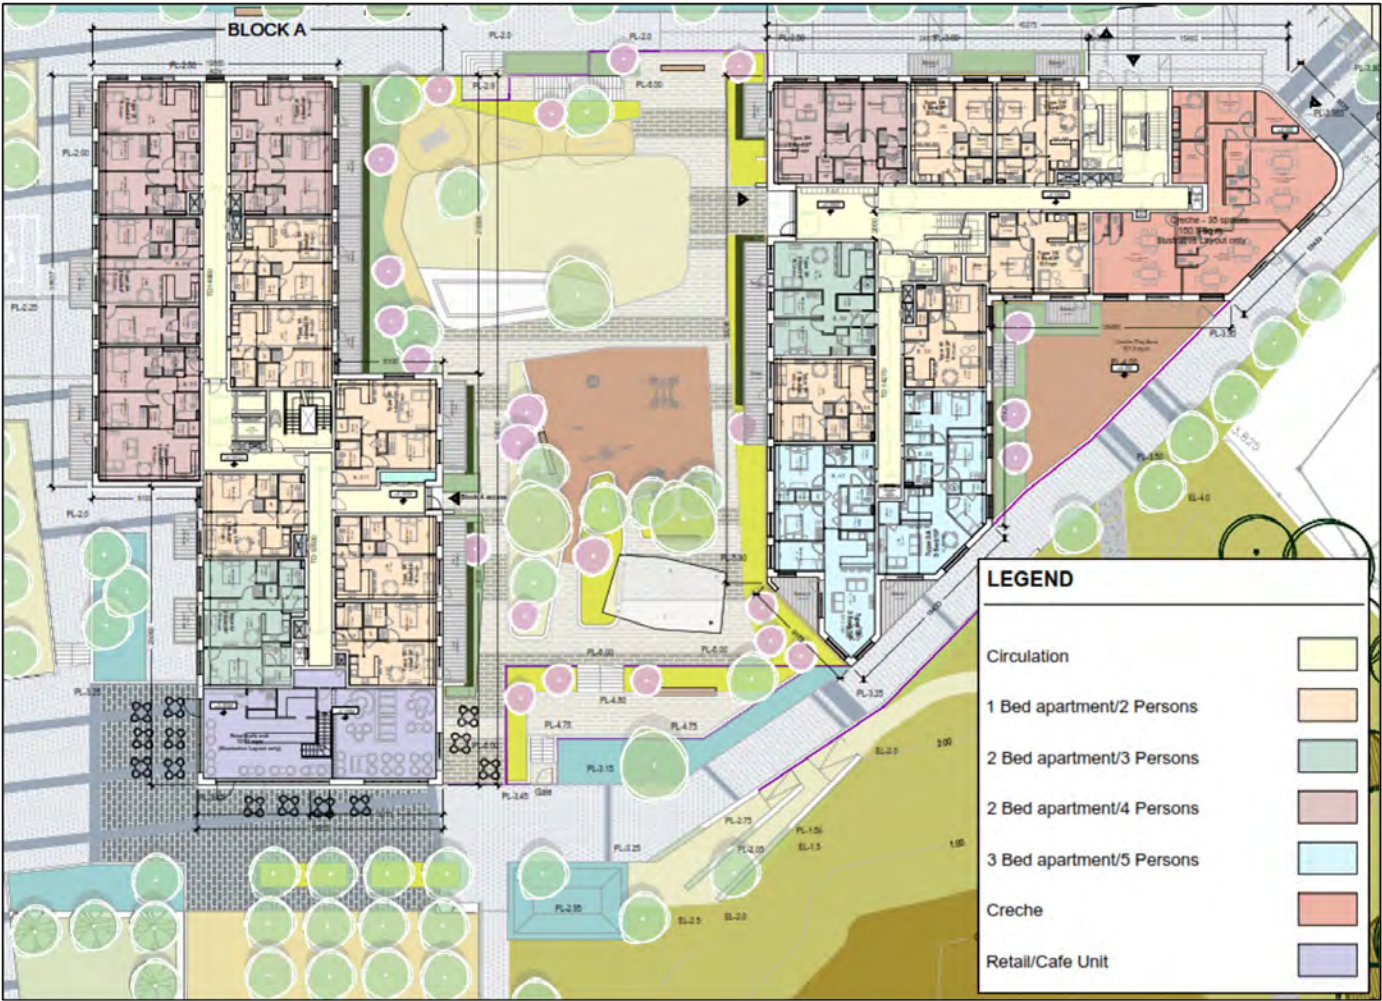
Ground Floor Layout Plan (Source: JFA)
